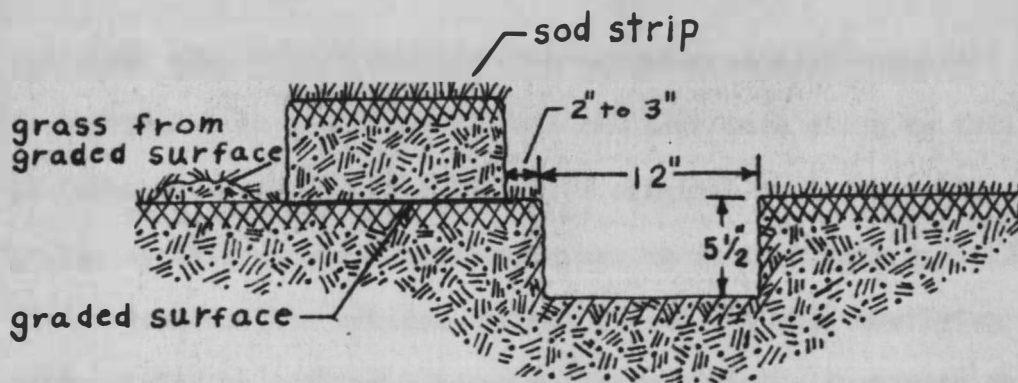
Cross-Section of Contour Furrow Showing Sod Strip Removed and Placed on the Lower Side of the Furrow.
